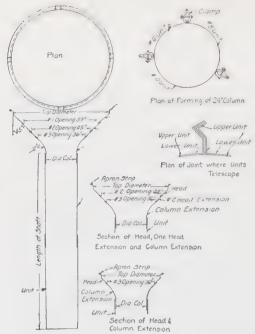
Hydraulic Pressed Steel Co. steel column forms.
